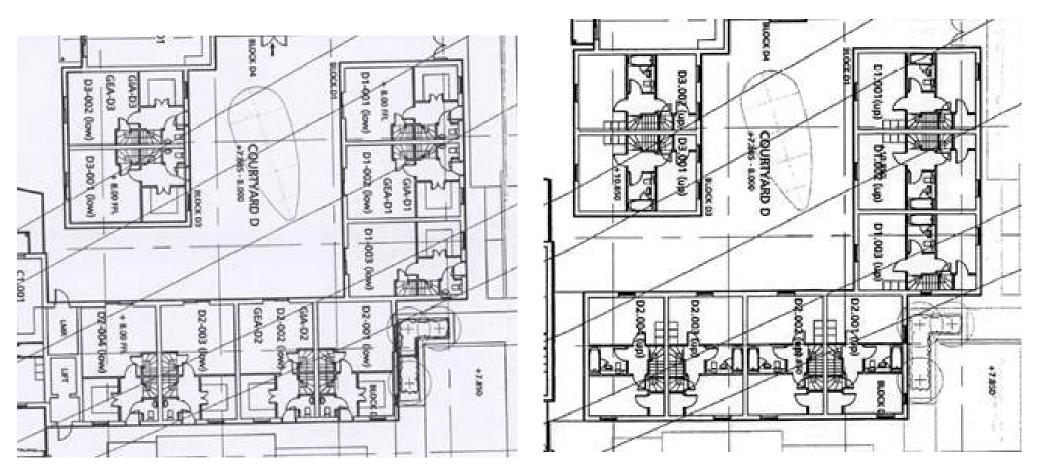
Benoy approved upper ground floor blocks D1 & D2
